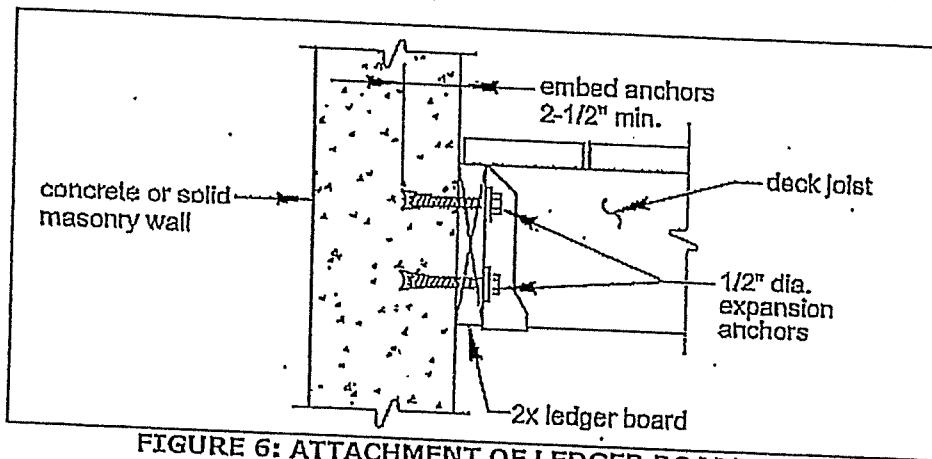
ATTACHMENT OF LEDGER BOARD-TO-FOUNDATION WALL (CONCRETE OR SOLID MASONRY)
